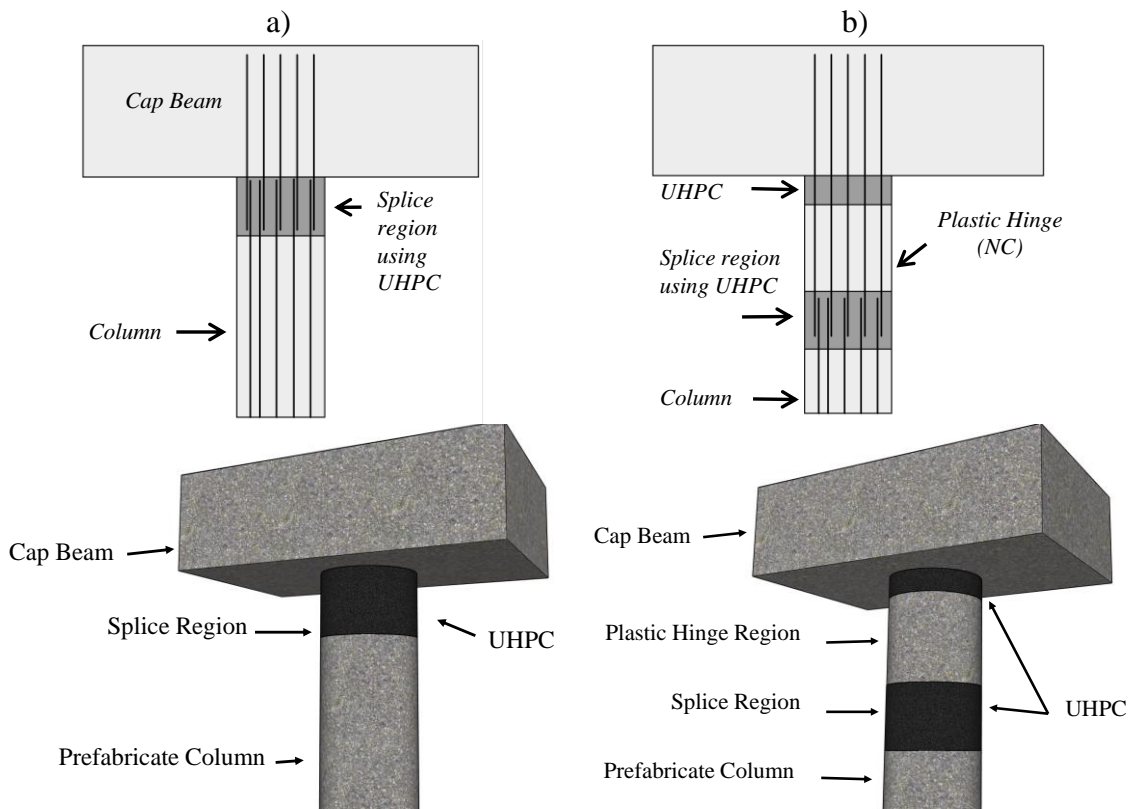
Details of the concept of the proposed connection a) Detail one b) Detail 2.
